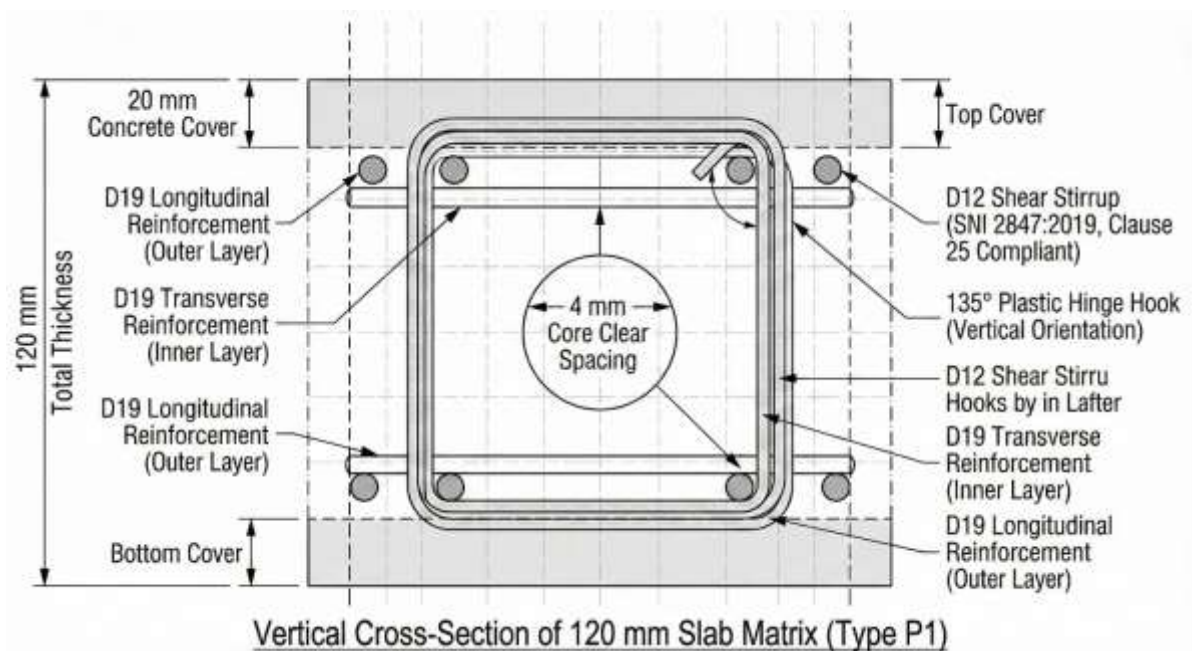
Visualisation of Cross-Sections Detailing the Constructability of Double Reinforcement for P1 Type Slabs
